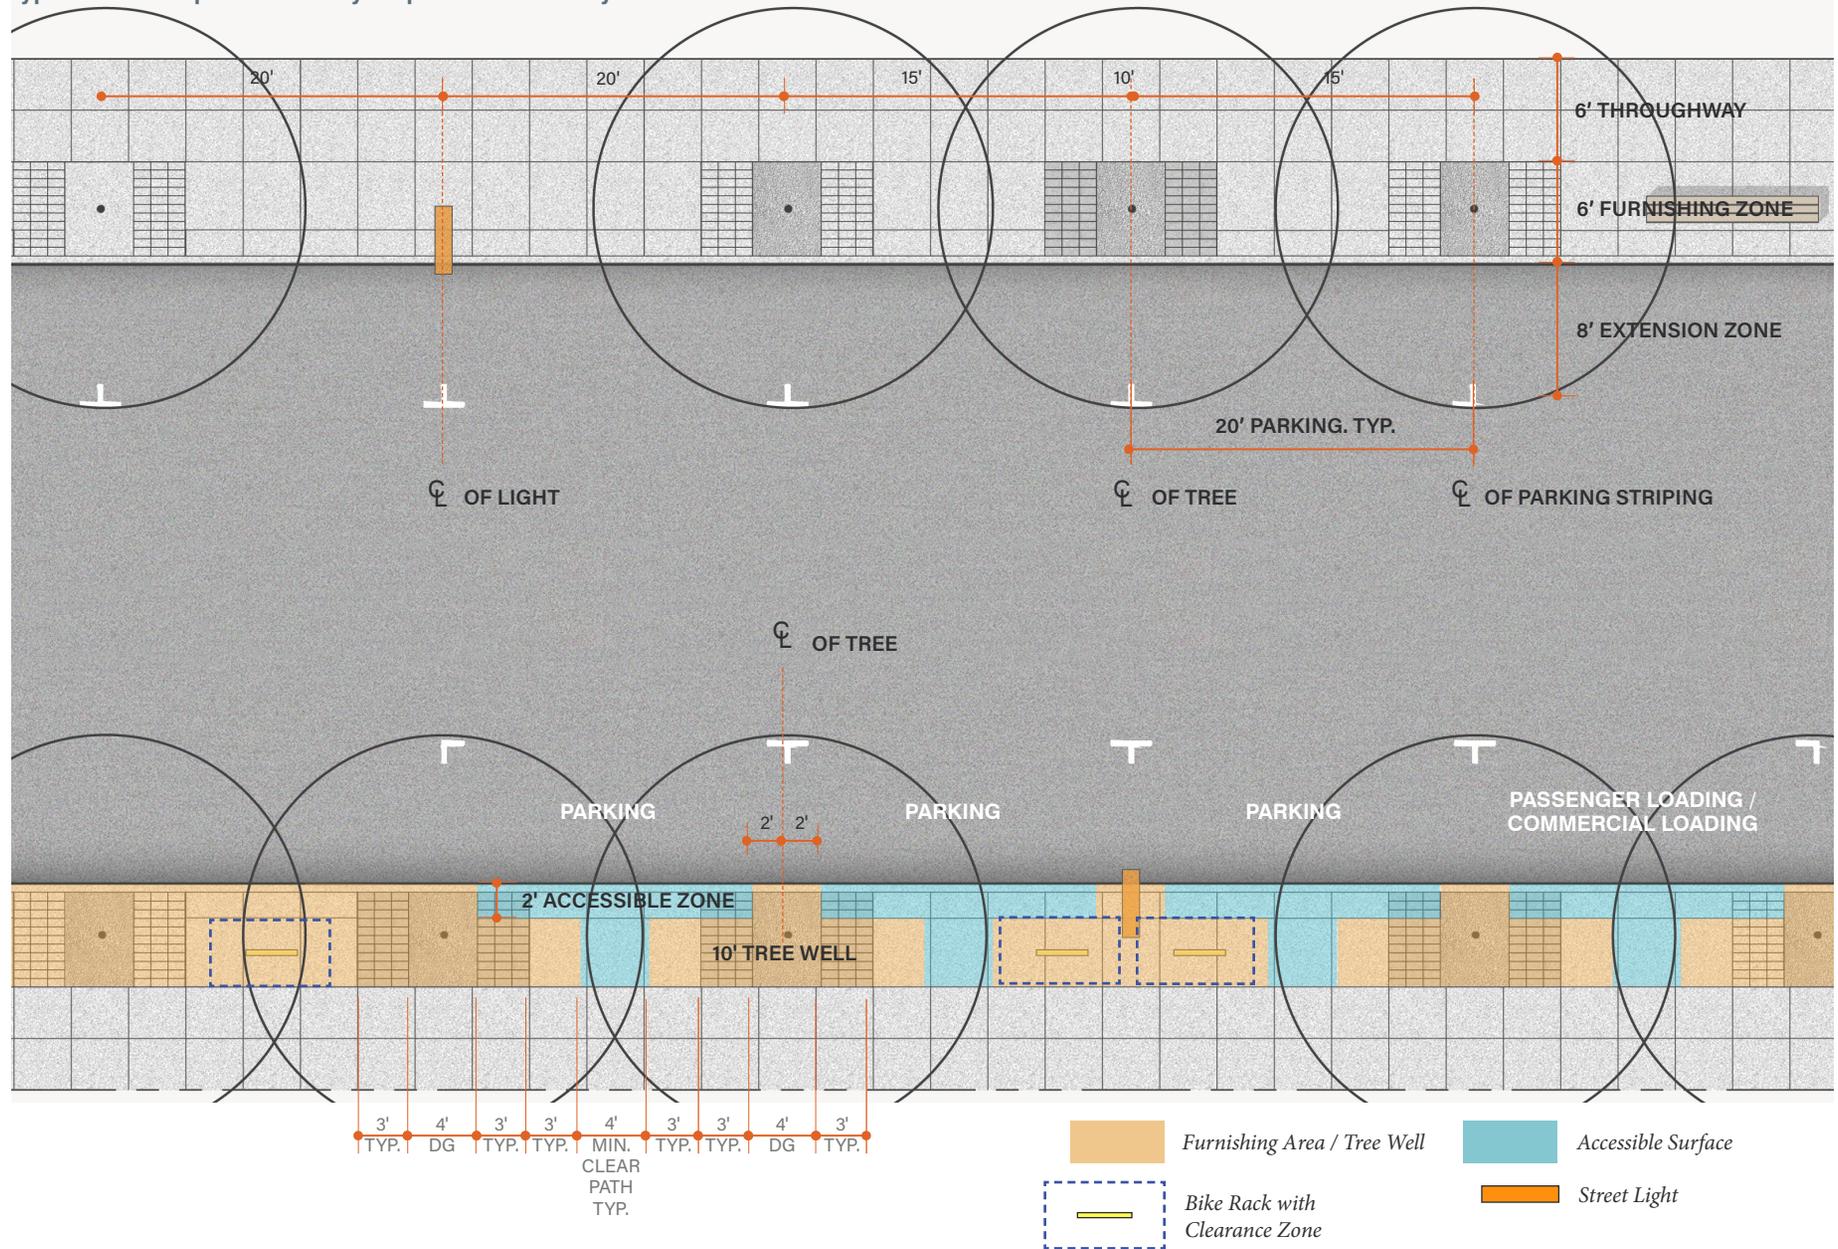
Typical Streetscape Accessibility Requirements and Layout
